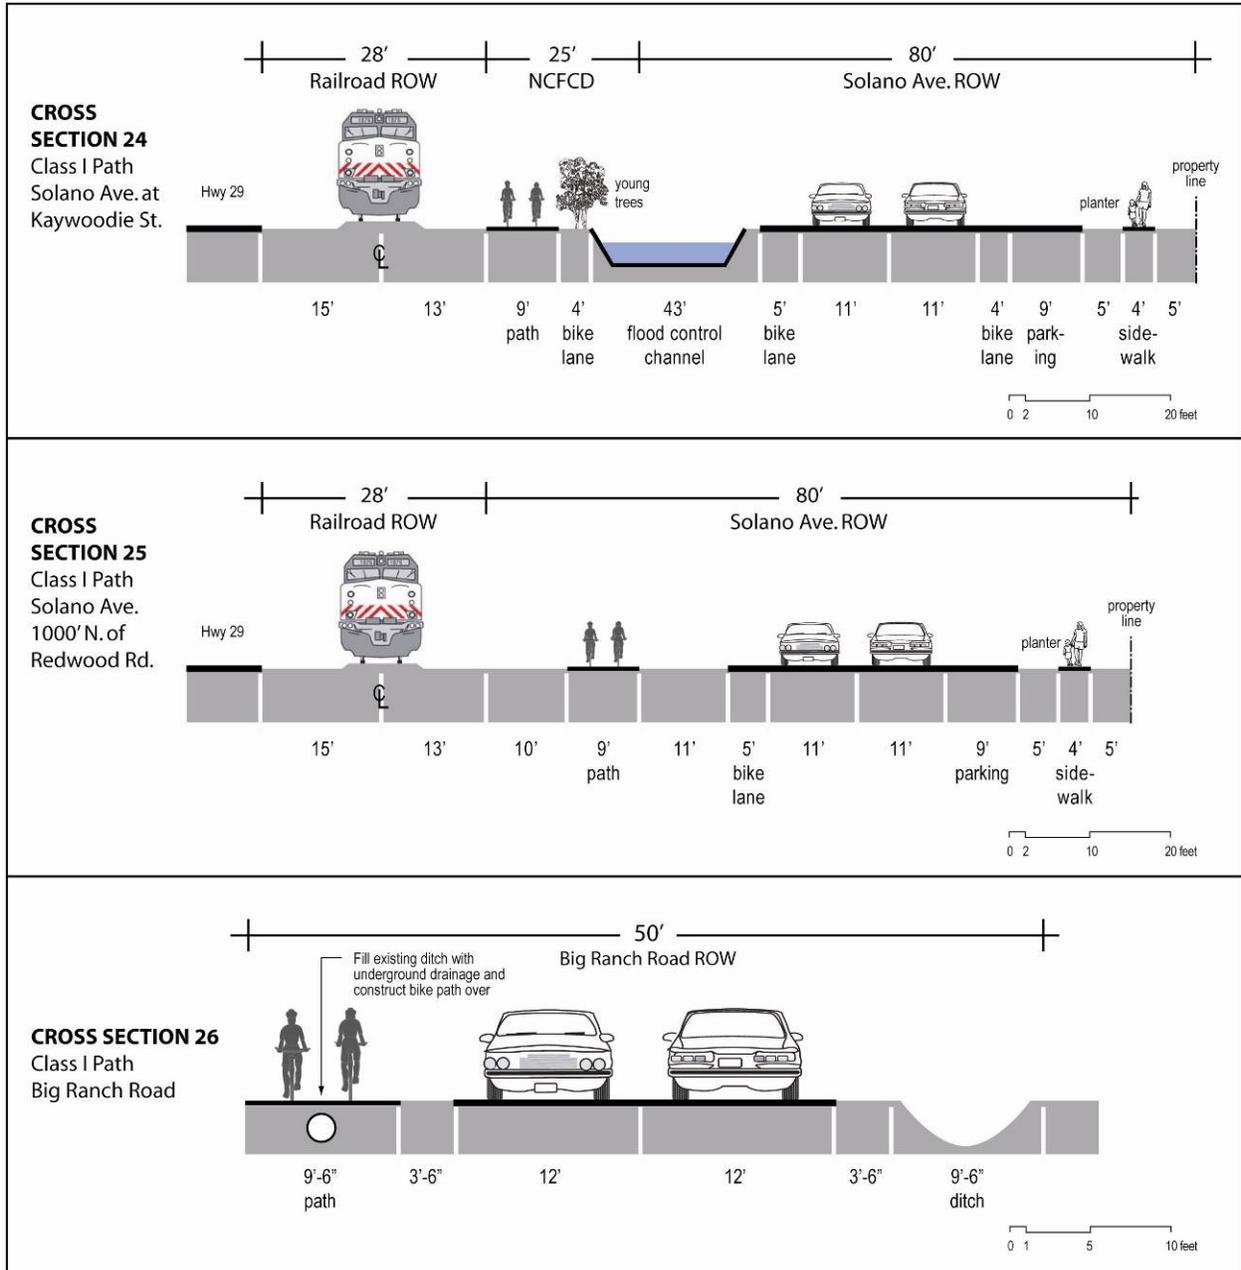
Napa Valley Greenway Typical Cross Sections
